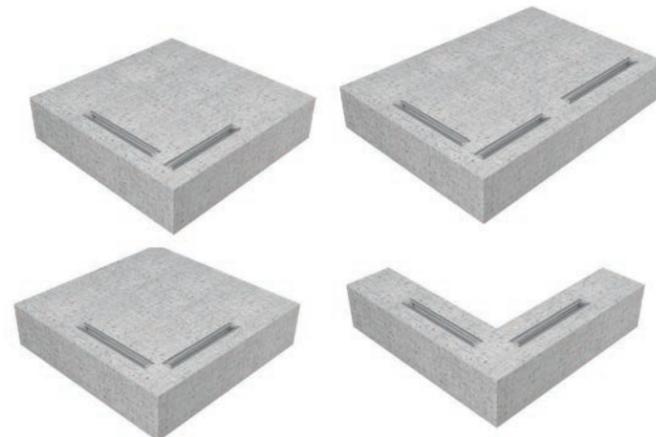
Corner configuration of pair of HAC-T or HAC-30 in top of slab.
